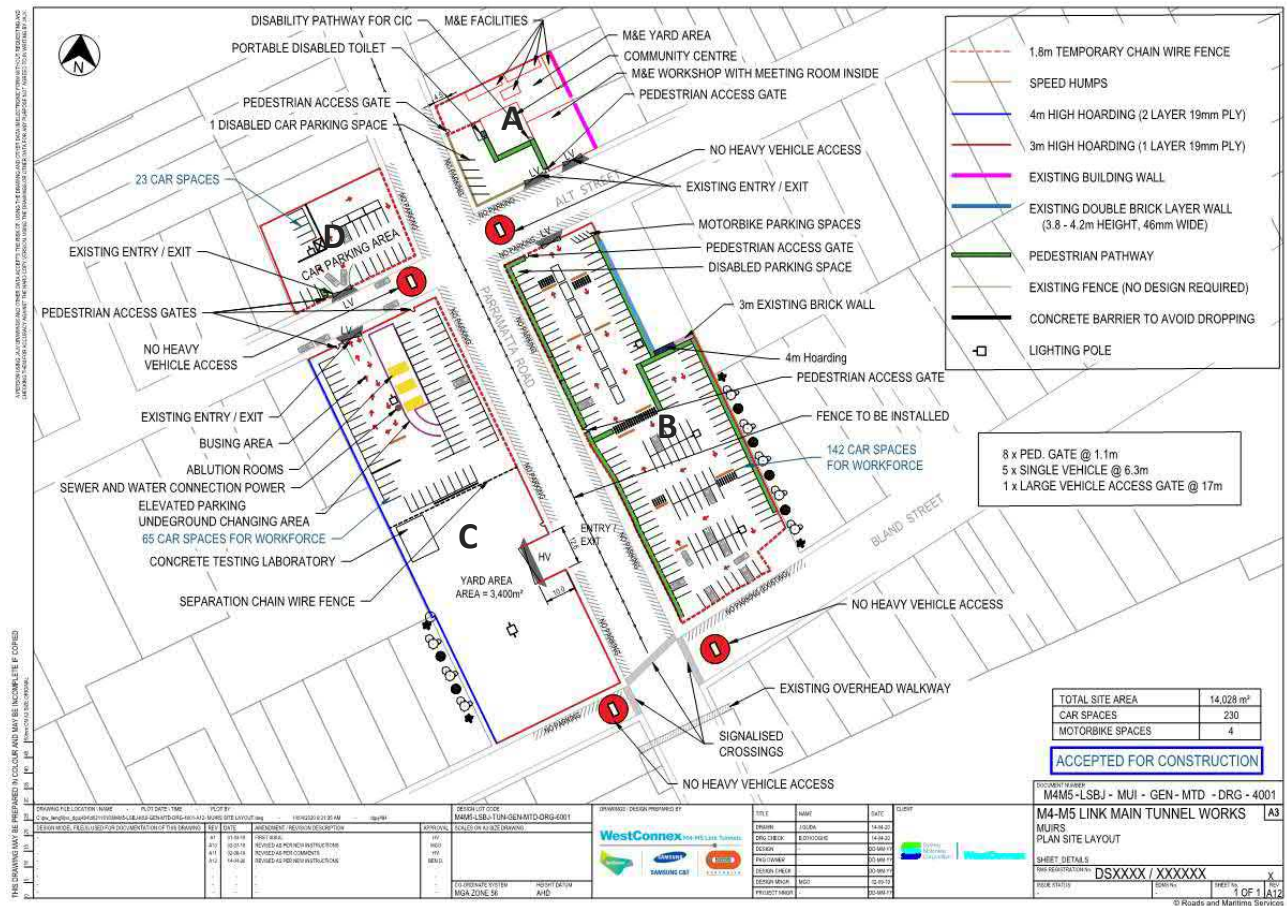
Parramatta Road East and West (C1b and C3b) layout
